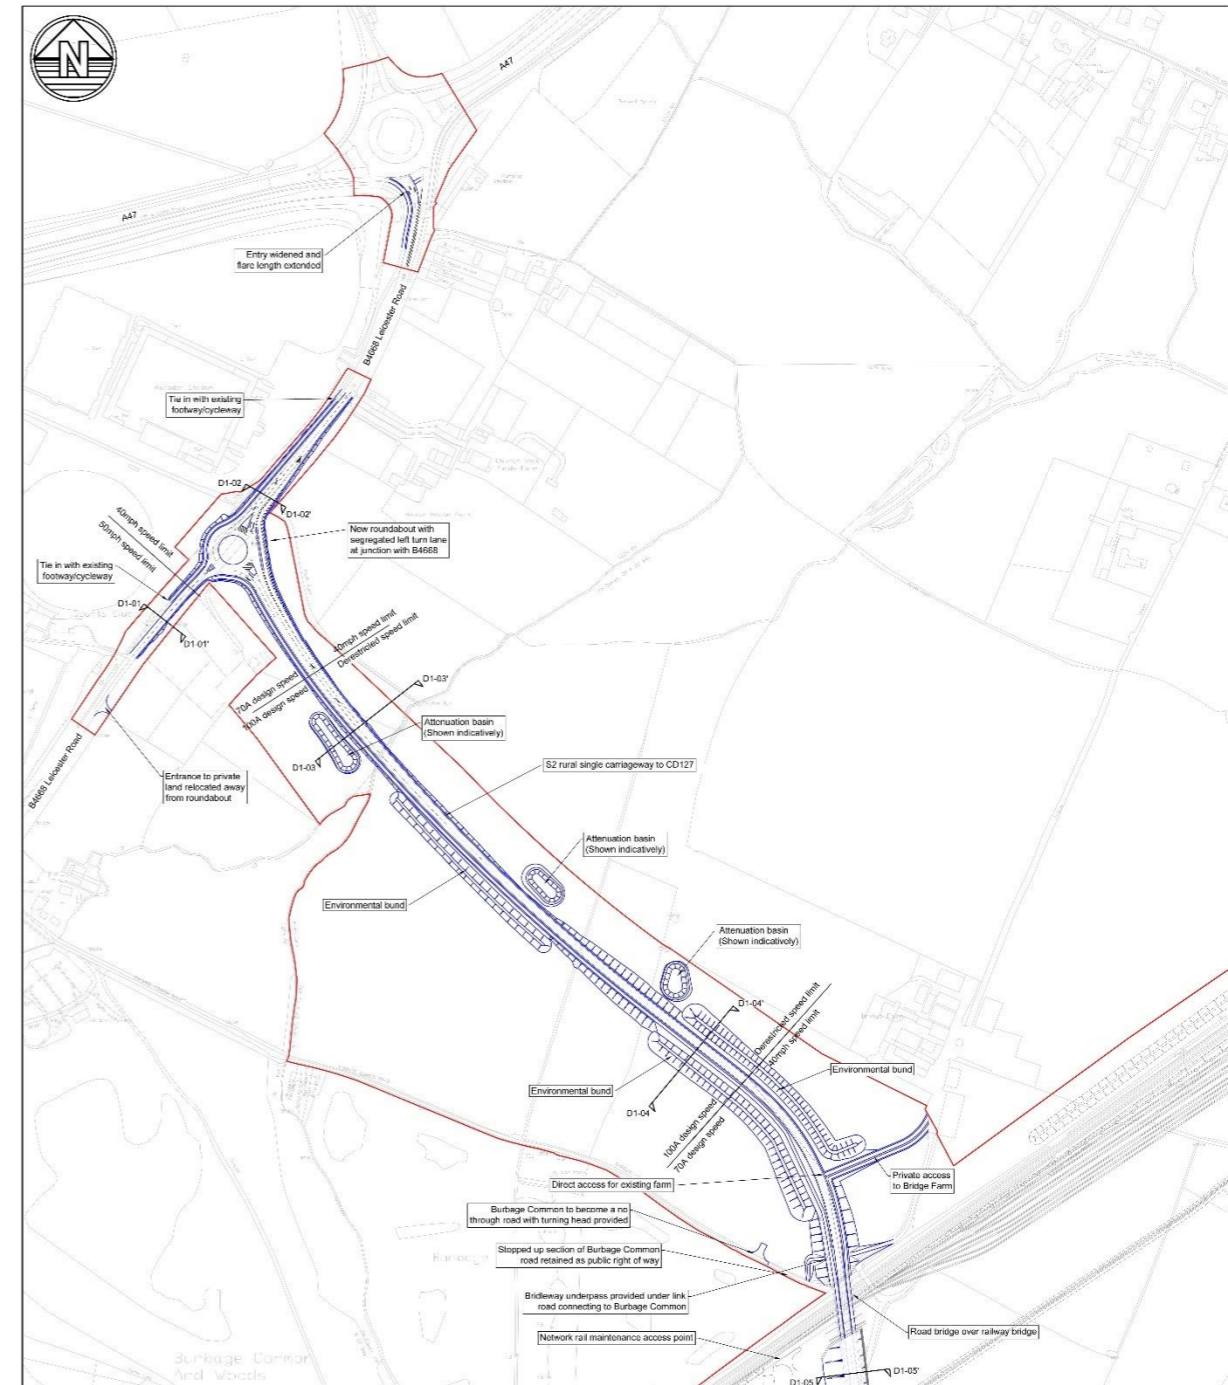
Railway Bridge Crossing, A47 Link Road and Leicester Road / A47 Connection
